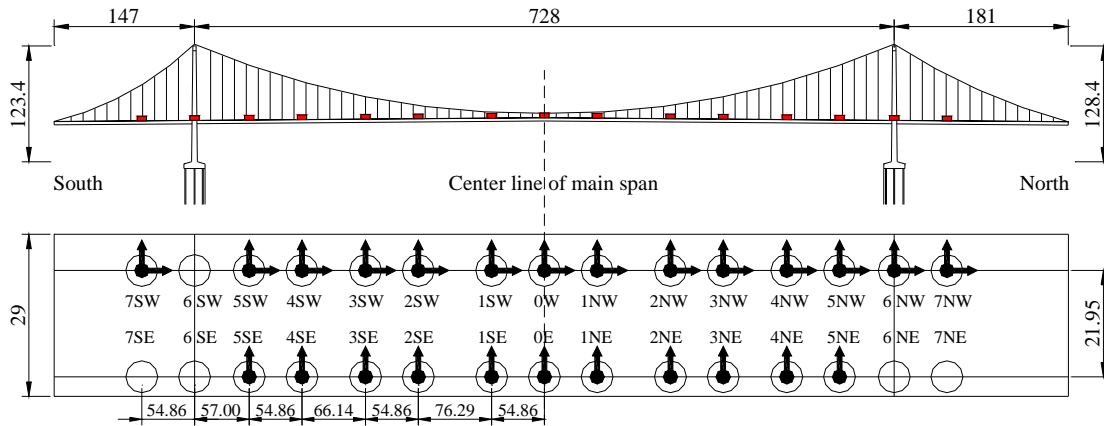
Overall dimensions of the AZMB and instrumentation (accelerometers) layout (unit: m)
